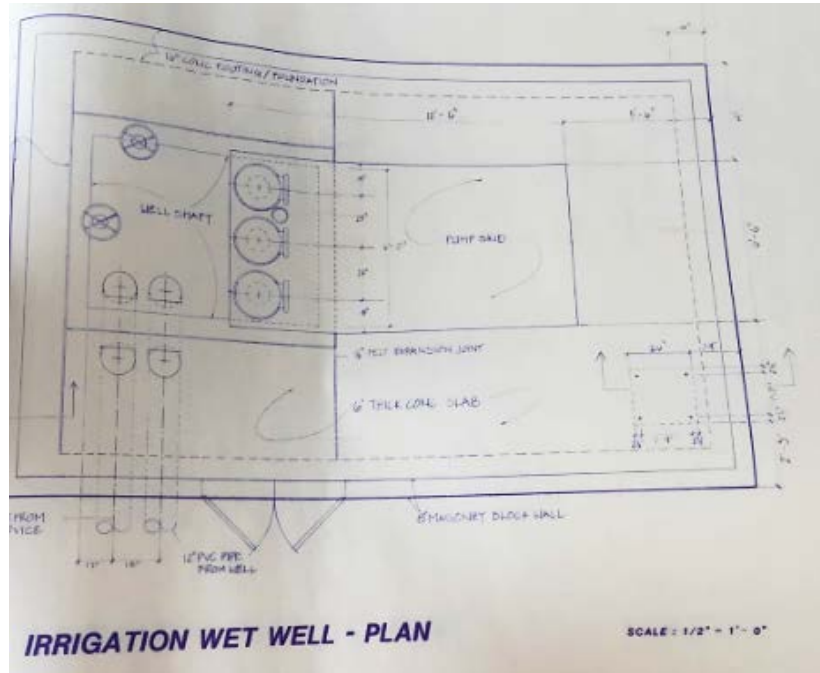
Design for Irrigation Pump House, Chester Washington Golf Course
